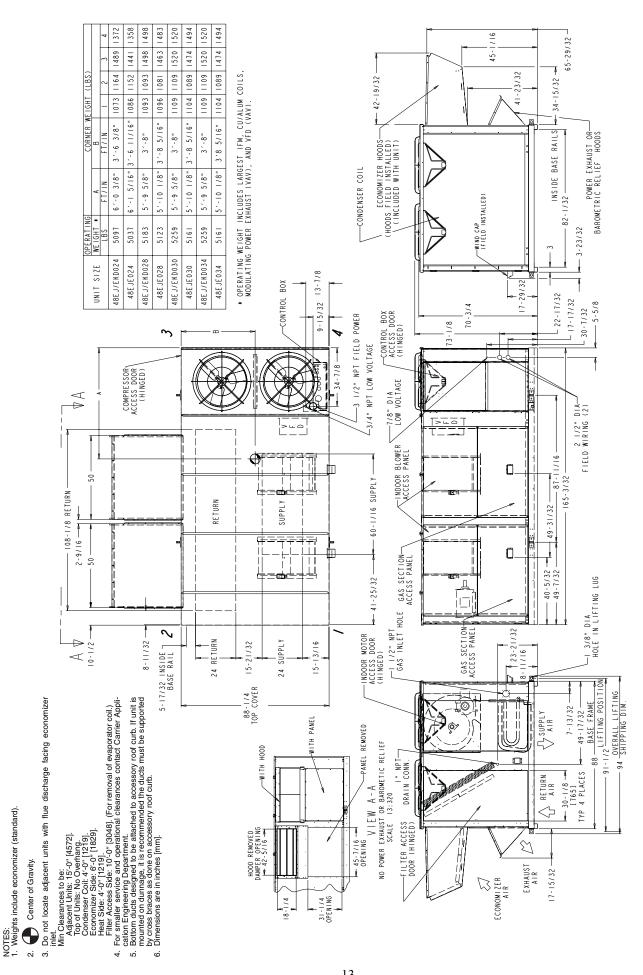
Base Unit Dimensions — 48EJ,EK024-034
